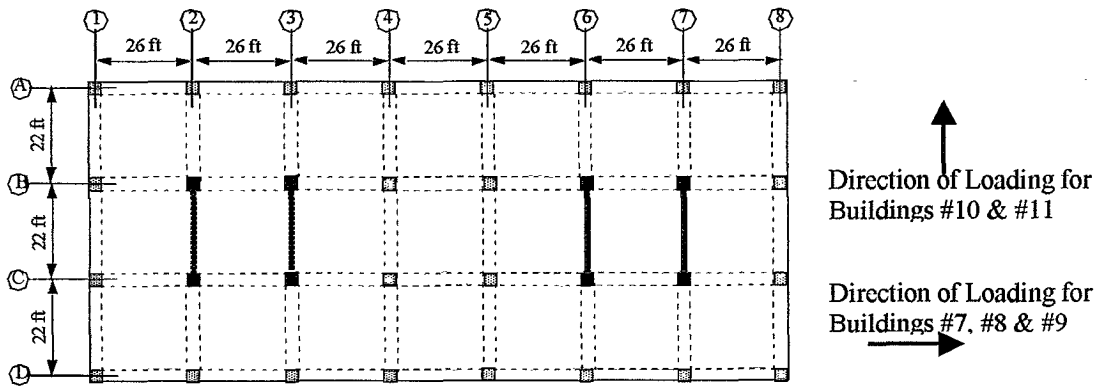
(a). Floor Plan of Office Building Studied – Buildings #7 and #10
